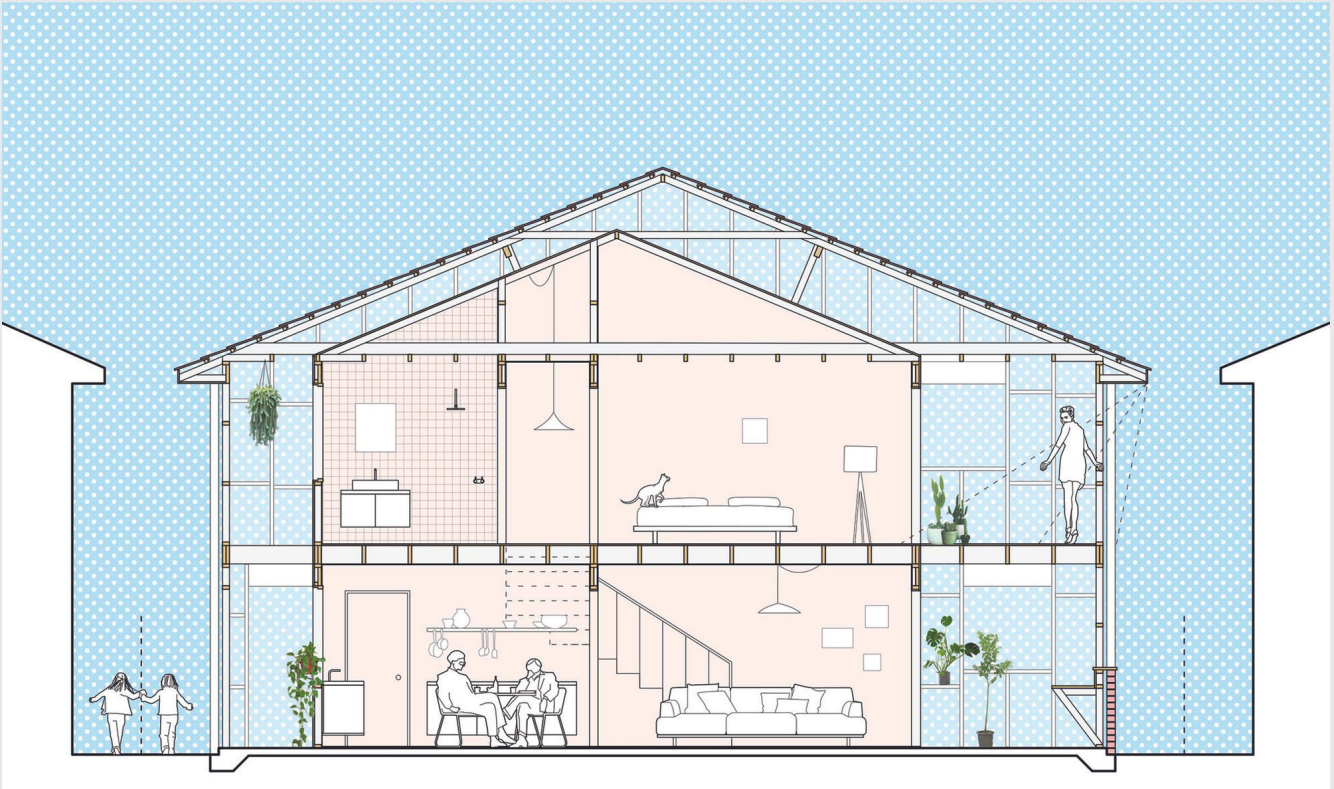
A new volume is literally “offset” within the existing frame to provide shade, privacy, and ventilation. Other Architects. 2025
